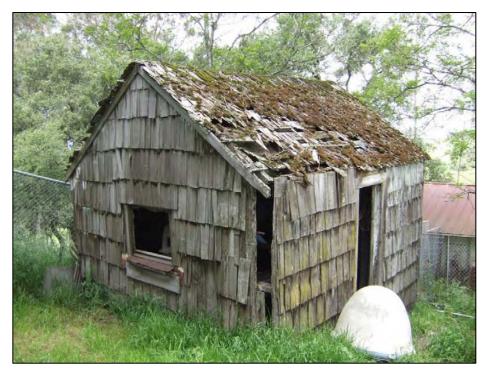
GZR-6, small shed, south and east elevations (previously approved for DEMO)
